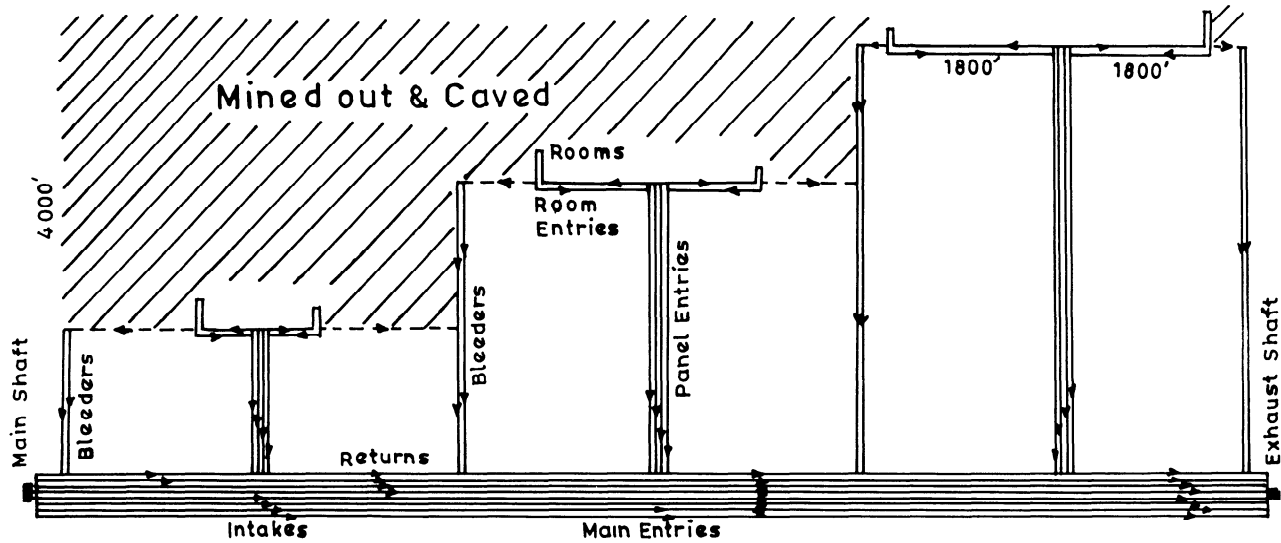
Plan of room and pillar coal mine being worked with continuous equipment (Trafton and Hartman, 1964).
